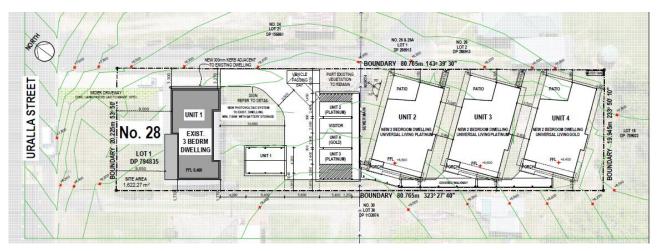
Proposed layout showing the existing dwelling and proposed new units (x3)
